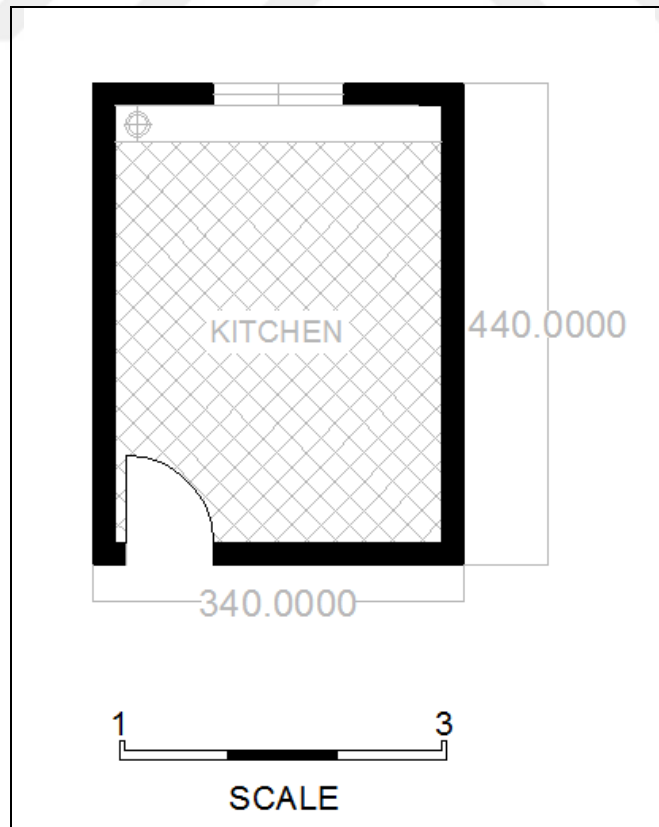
Shows: Traditional Somali Kitchen Floor Plan.
